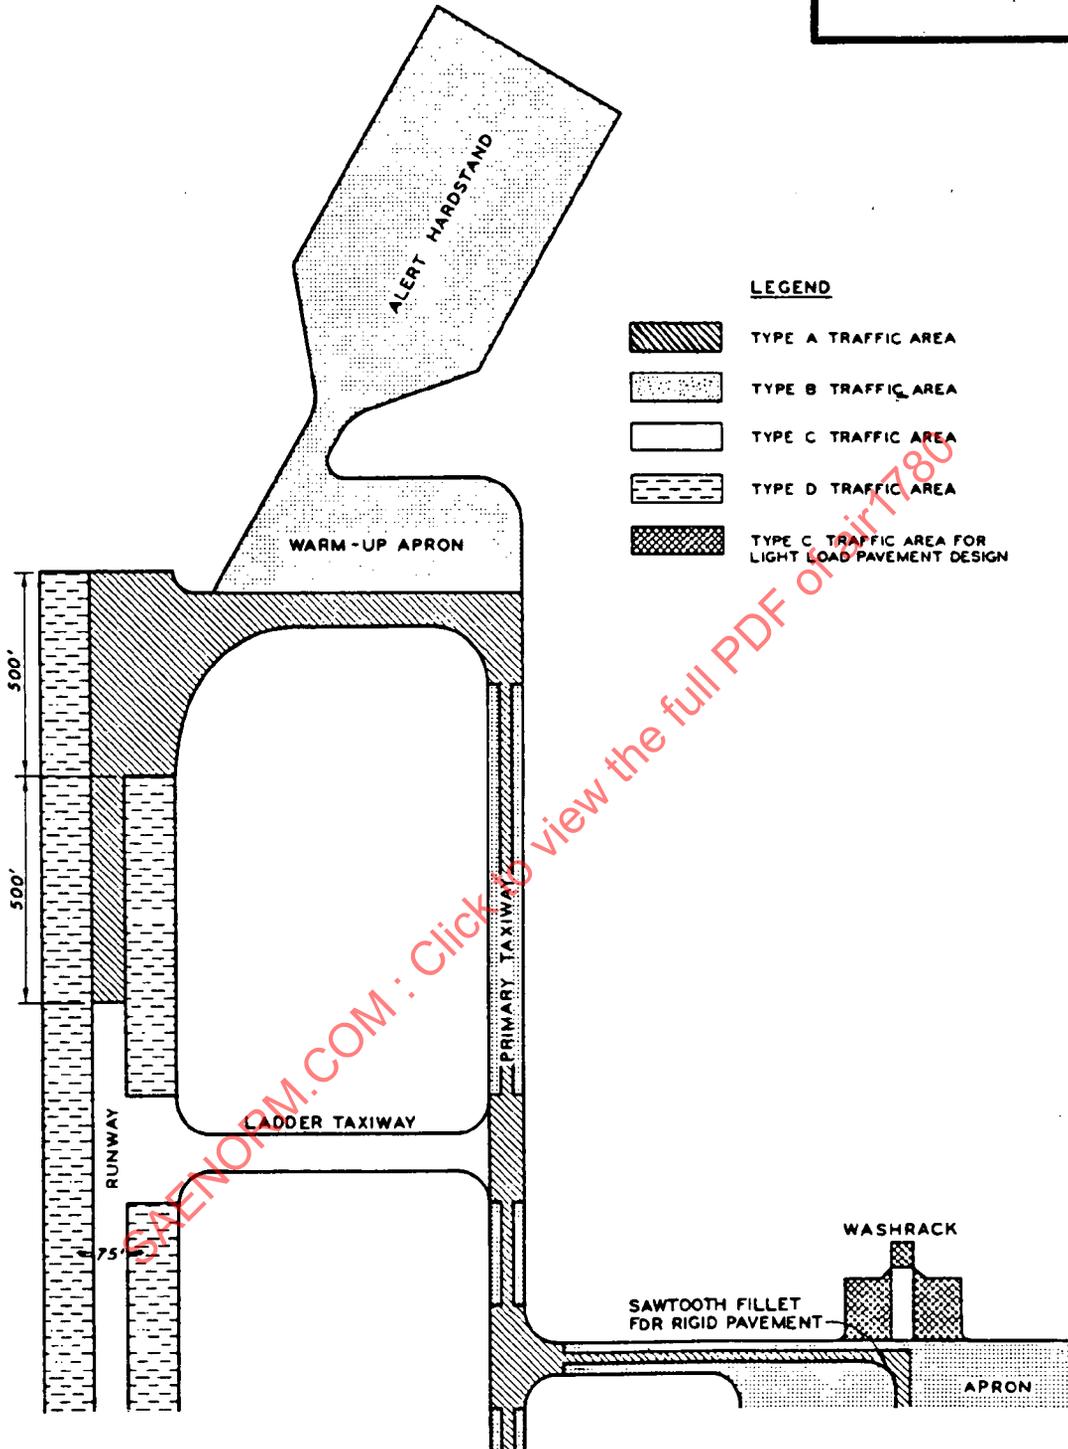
Typical Layout of Air Force Heavy - Load Pavements
